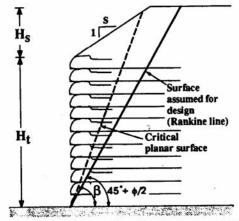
Reinforced soil wall with sloping backfill showing potential failure surface assumed in conventional design.
